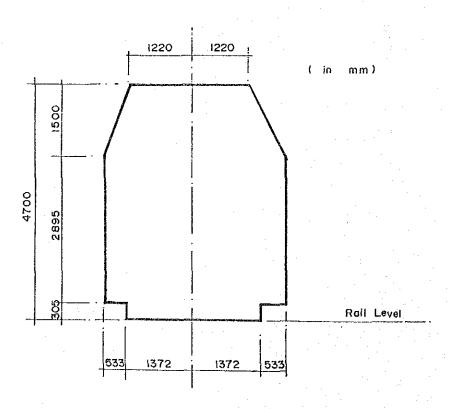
CONSTRUCTION GAUGE OF RAILWAY
